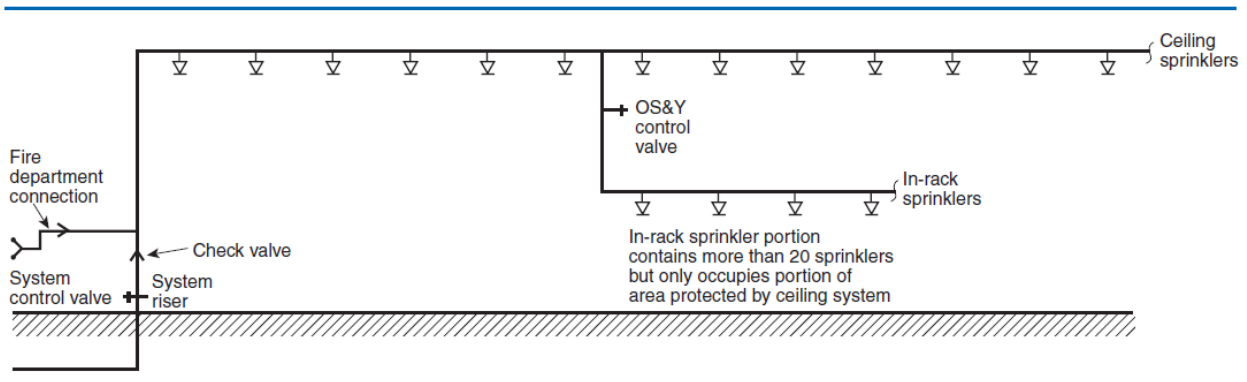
In-Rack Sprinklers Occupying Only Portion of Area Protected by Ceiling Sprinklers.
